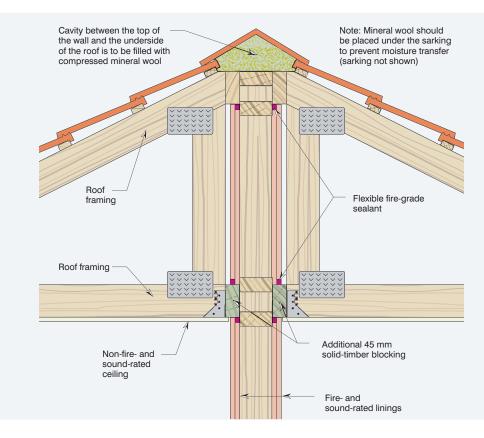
Timber trusses supported off sacrificial-timber blocks – FRL 60 minutes – elevation view.
